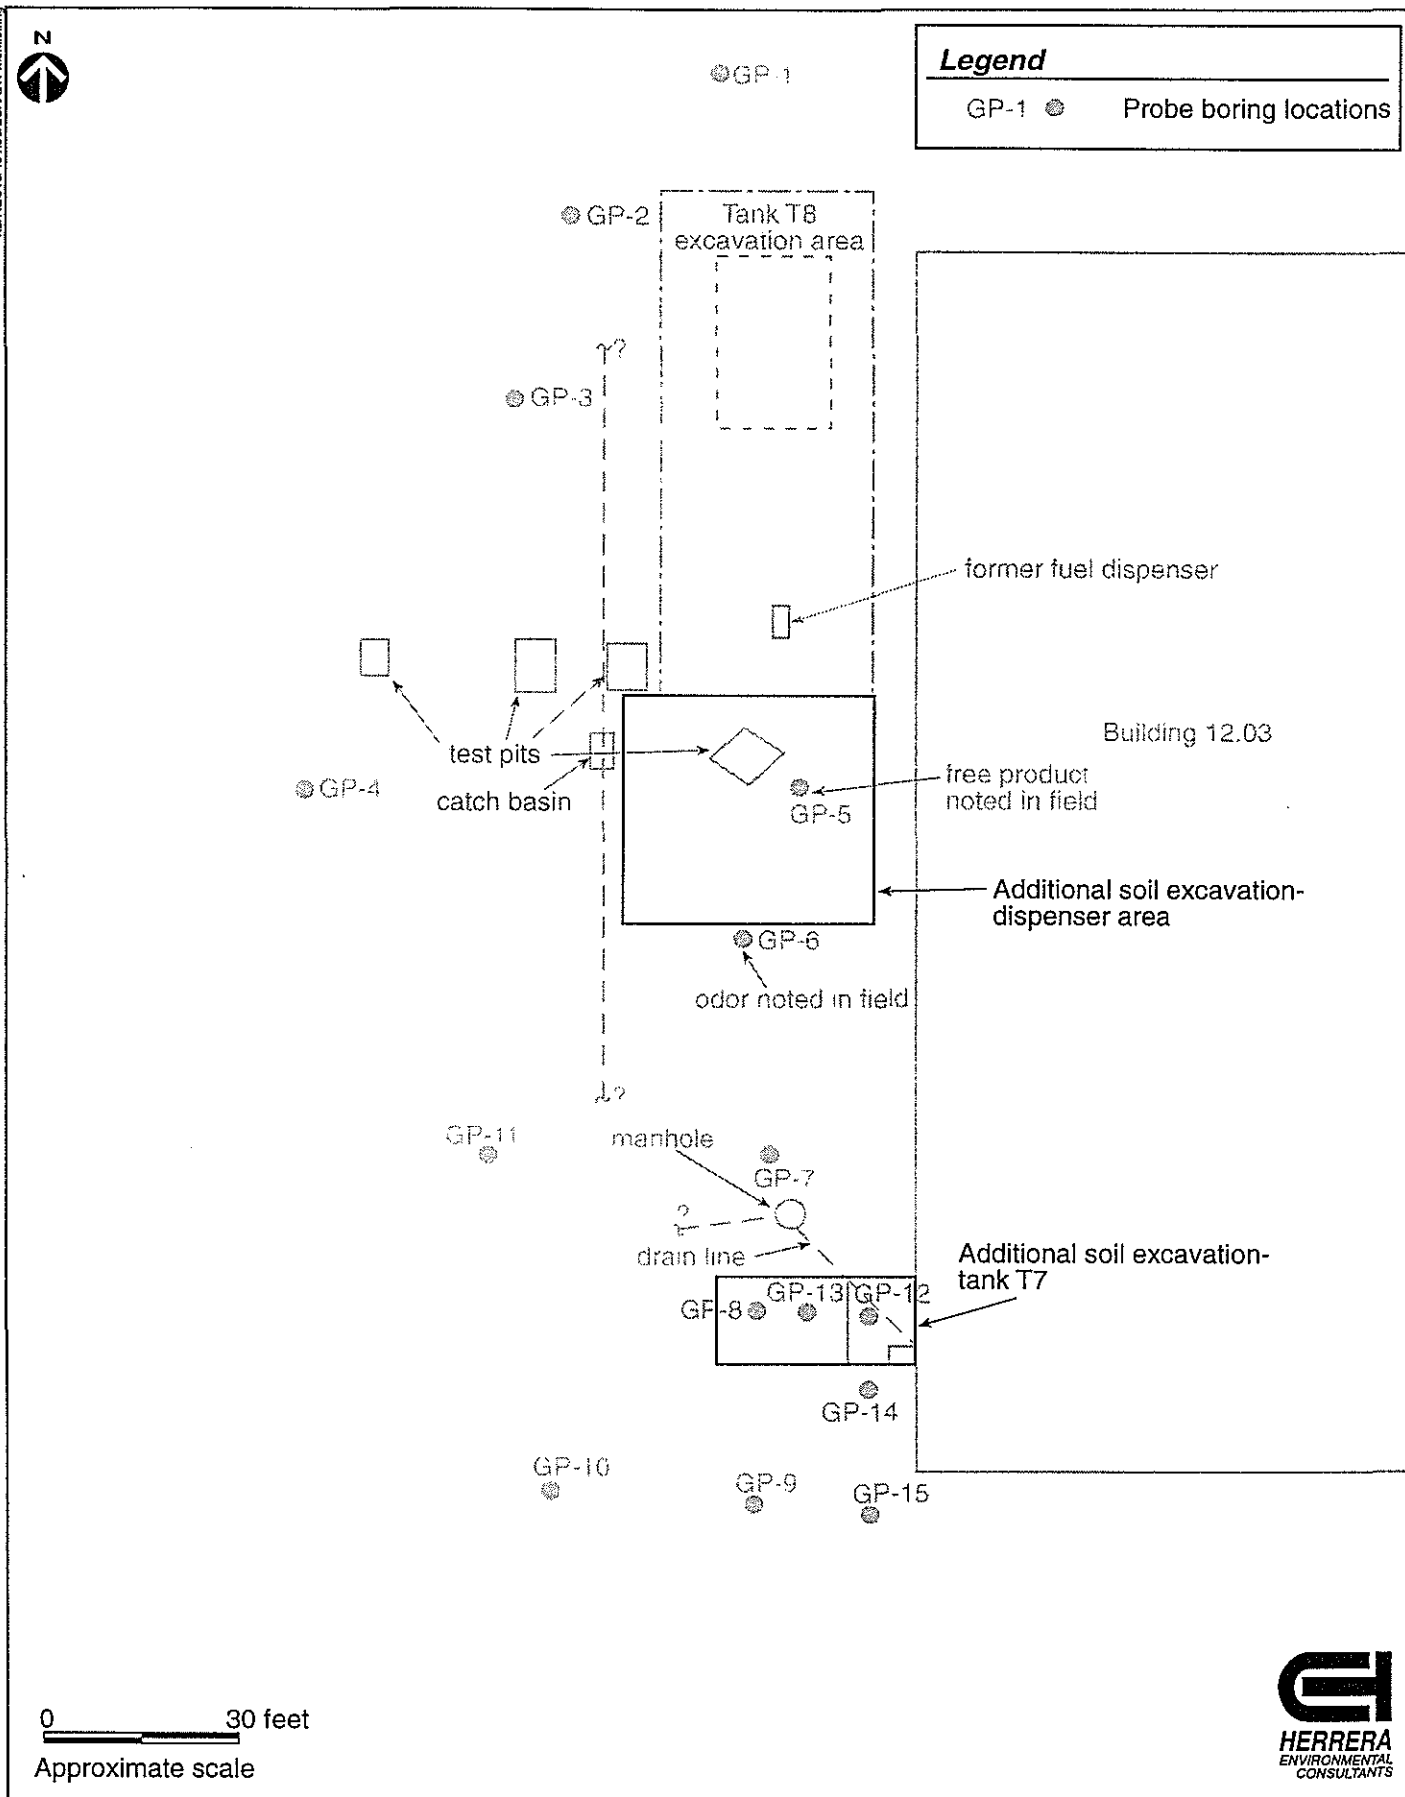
Areas of additional soil excavation near tanks T7 and T8 at Federal Center South, Seattle, Washington.
